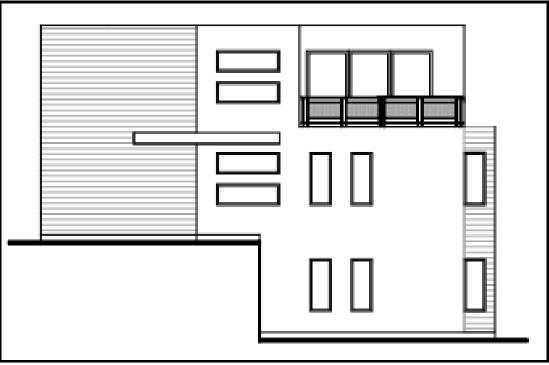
Building C South Elevation View Showing Cut Into Ground (source: McKinley 2018)
